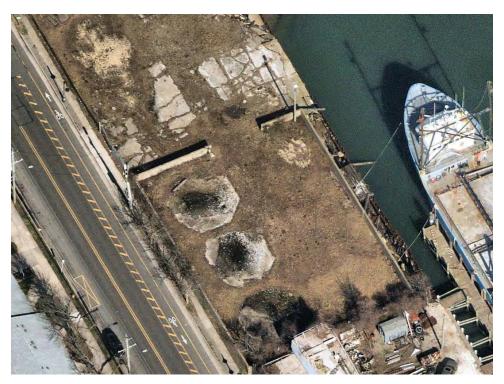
Example of former building foundation and general debris adjacent to North end of existing bulkhead.
